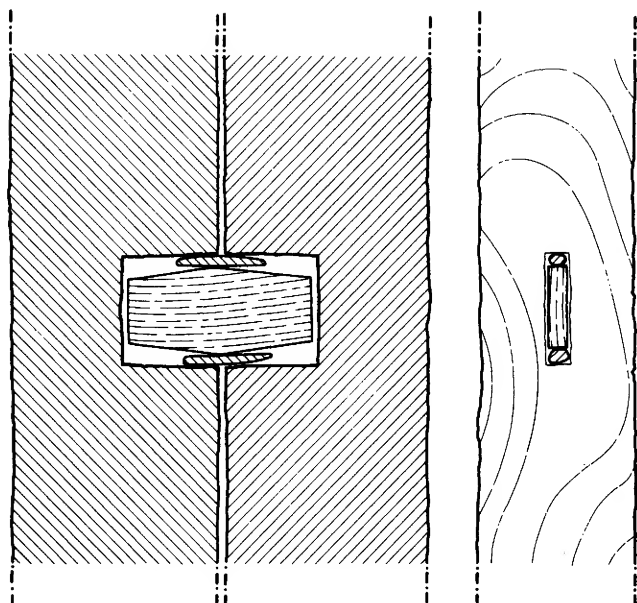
Schematic plan and section through mortise-and-tenon joint between two timbers.
